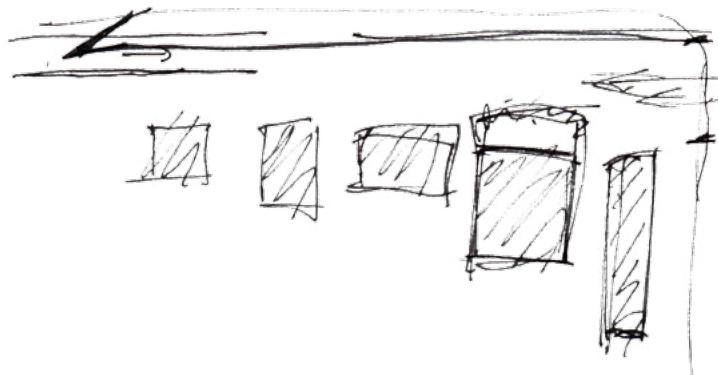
Sketch of a series of buildings surrounding a centre
